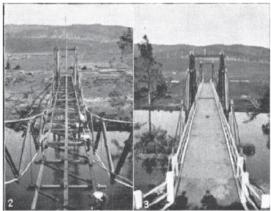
Overview of the Double-Crossing Bridge³⁰
